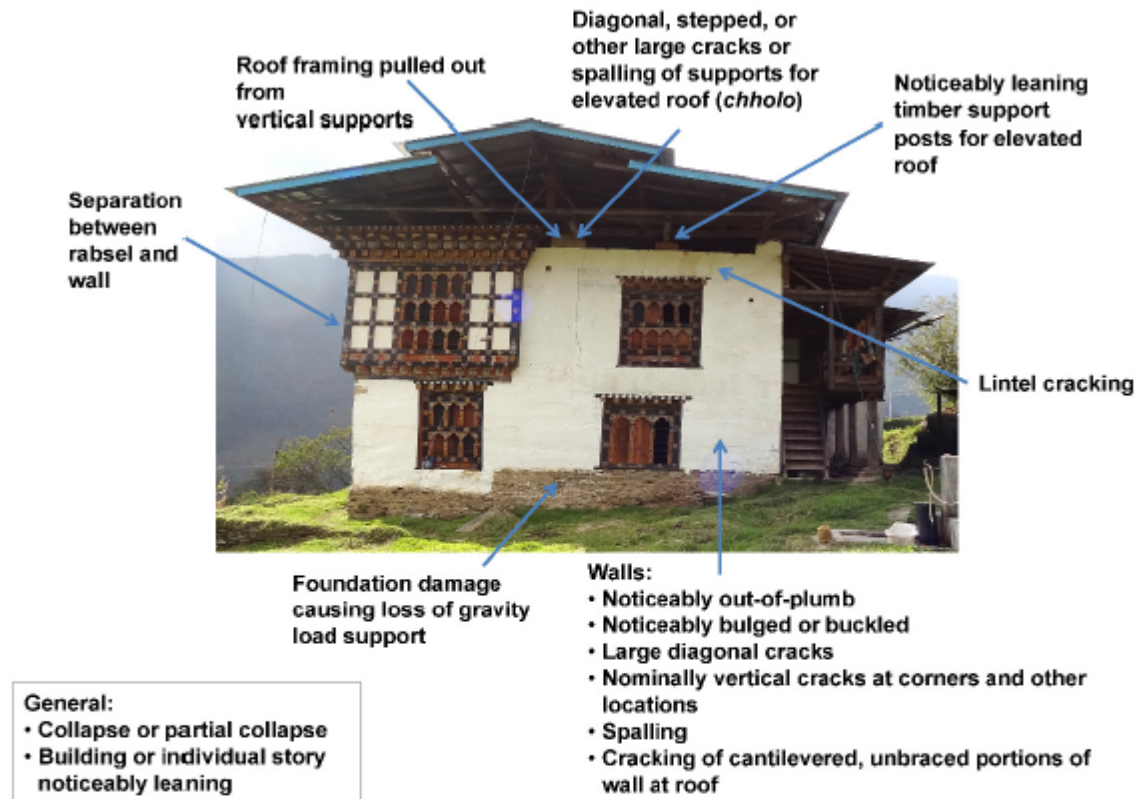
Photo showing a rammed earth building in undamaged state. Highlighted points indicate potential areas and types of damage that should be inspected during the evaluation. Interior conditions are not shown, such as floor framing pulled out from vertical supports, timber column (*kaw*) noticeably out-of-plumb, buckled, or failed, and failure or incipient failure of significant vertical-load-carrying element.
